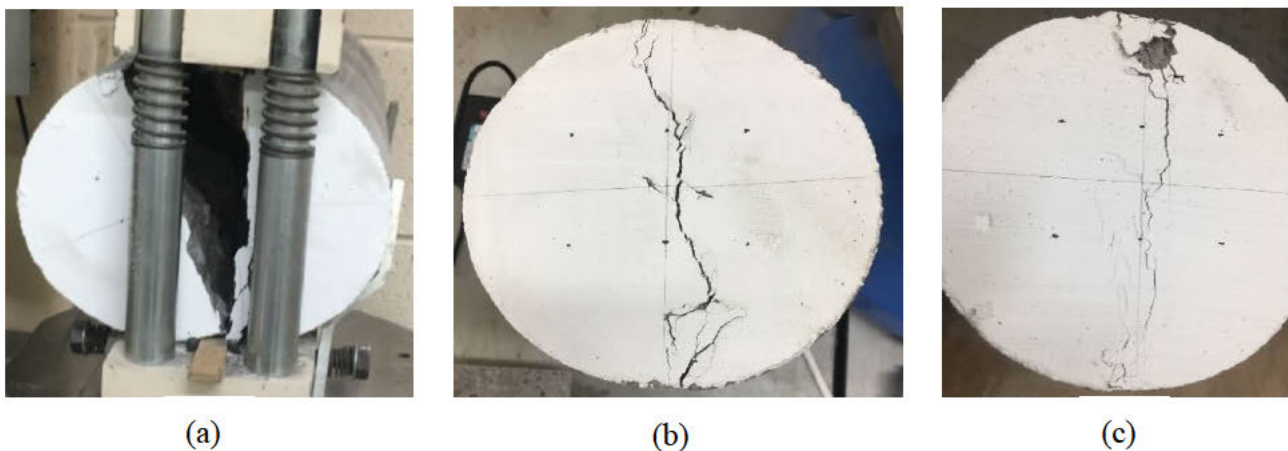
Failure of concrete cylinders during splitting test for (a) set 1 - normal concrete; (b) set 2 - 0.5 % fibres; and (c) set 3 – 1 % fibres
